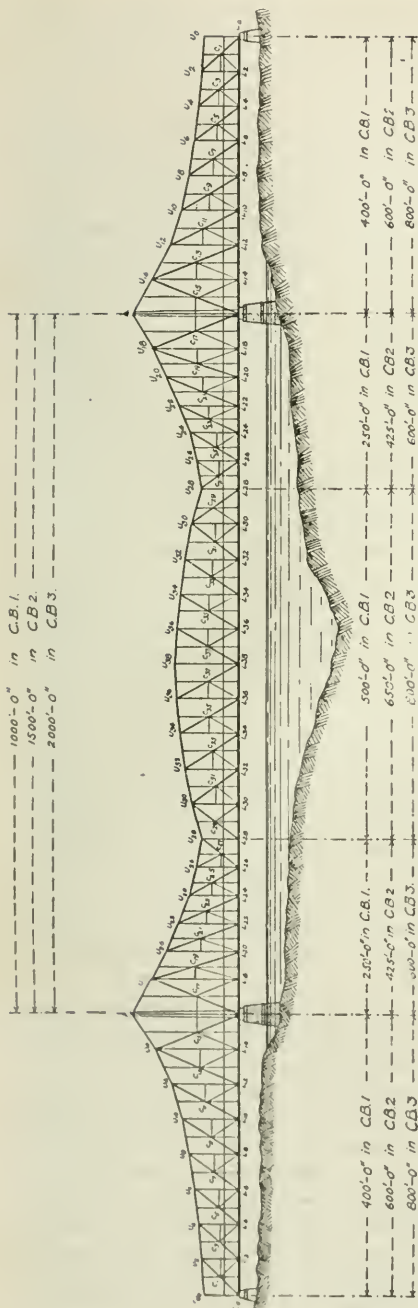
Dr. Steinman's Layouts for Cantilever Bridges.
